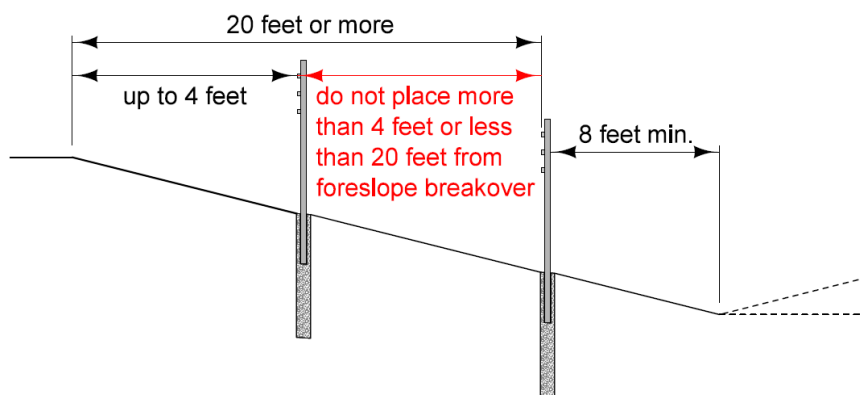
High tension cable guardrail placed on slopes 4:1 to less than 6:1.
